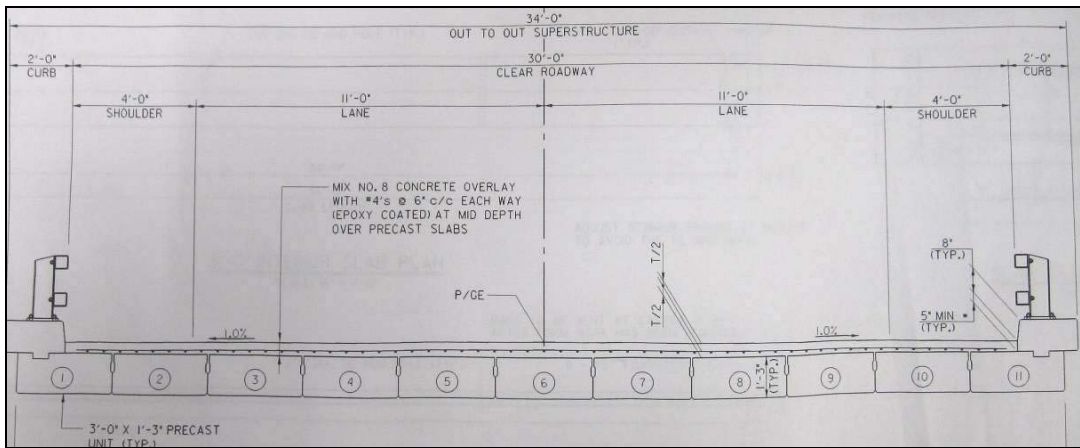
Structure No. 0901100 Wallace Creek Bridge (Elevation View)
